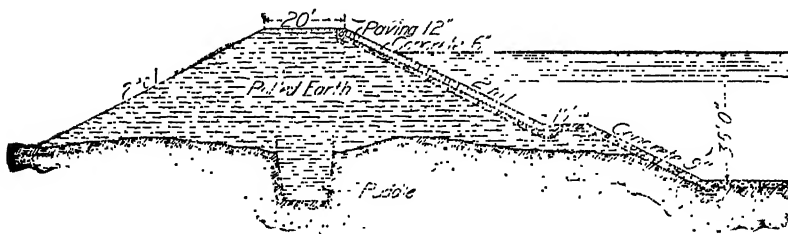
Reservoir Embankment, Syracuse, N. Y.
